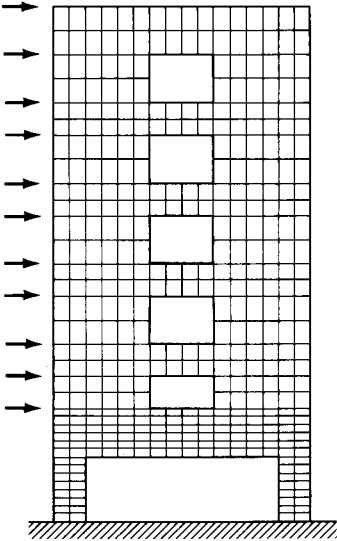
Shear wall with arbitrary openings. Finite element model.
